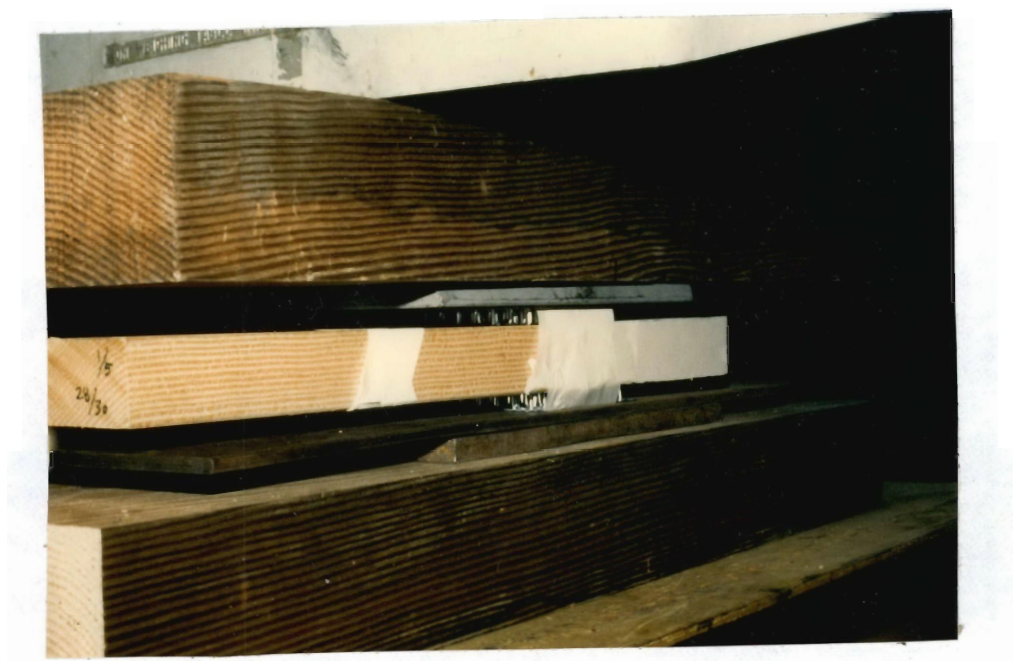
Apparatus used to assemble truss-plate joint specimens.
